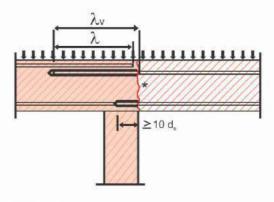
End anchoring of slabs or beams, designed as simply supported.
